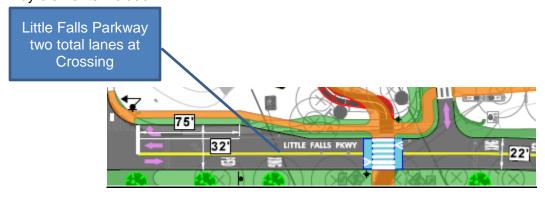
Recommended Facility Plan: Permanent Road Diet with Speed Table Crossing
